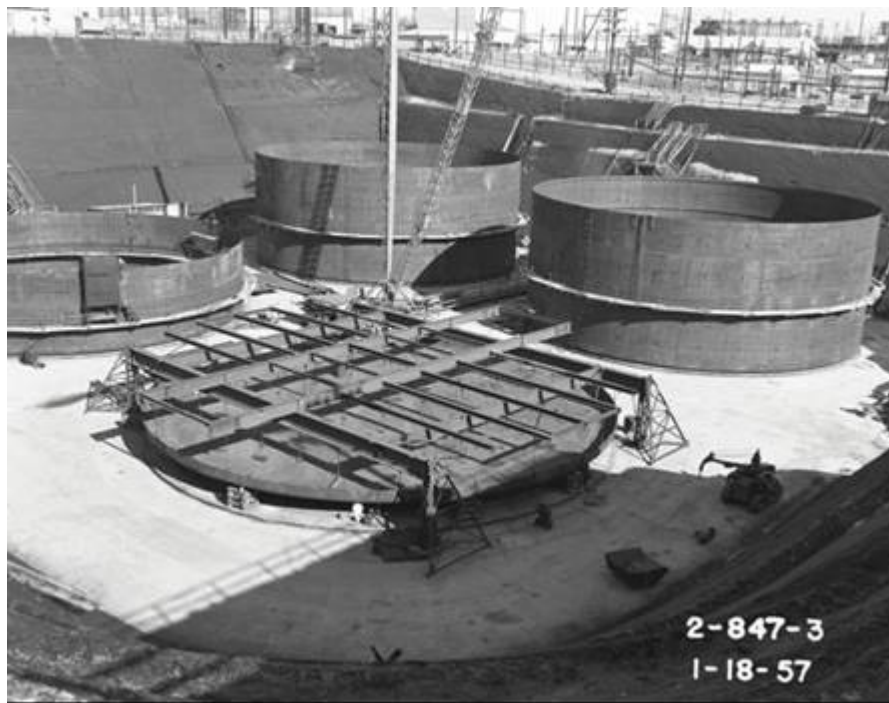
Construction of the Primary Liners in Type IV Tanks (View 2)
